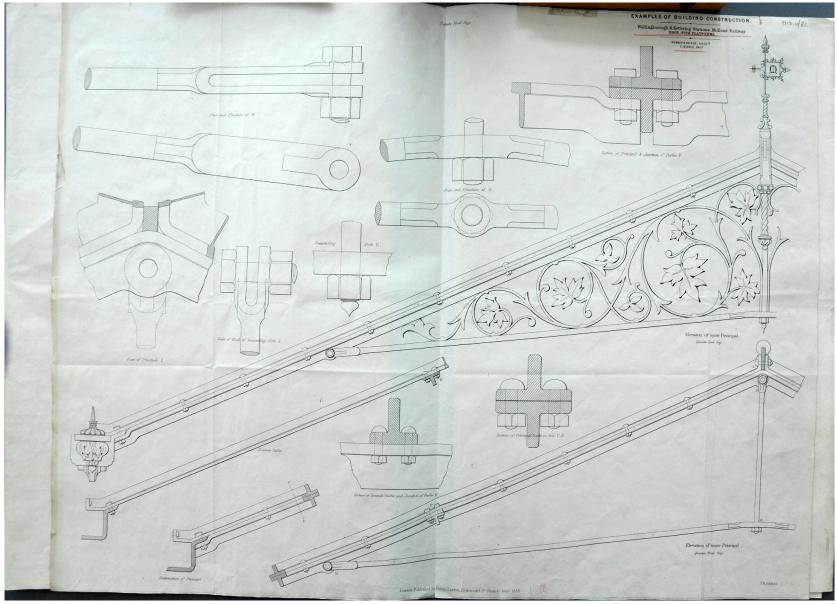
Detailed drawings of the 1857 canopy signed by Driver and reproduced in Henry Laxton's Examples of Building Construction in 1858
